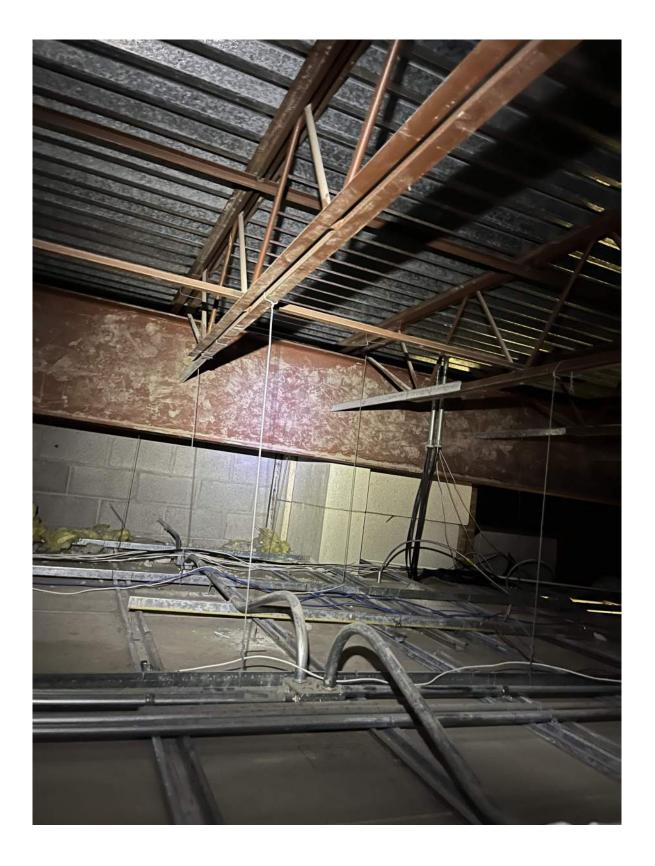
Support of 1st floor suspended ceiling in 1991 addition
